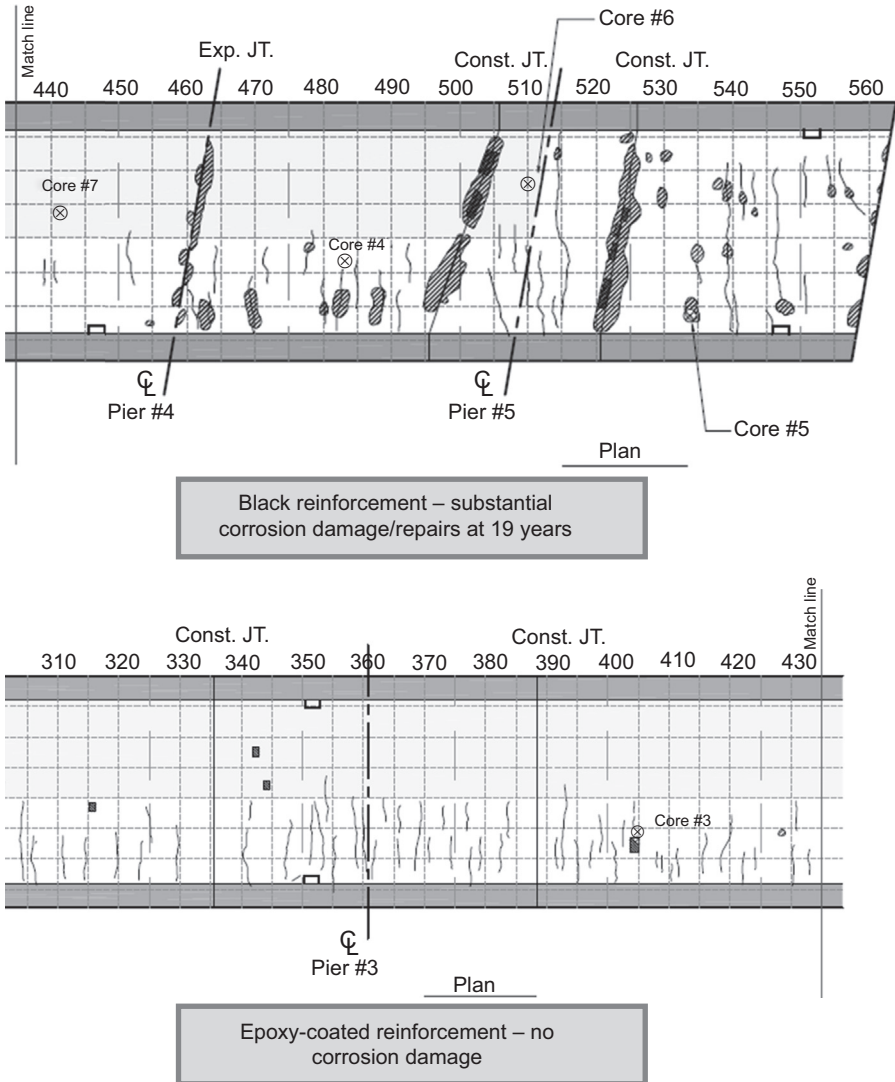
Deterioration maps of West Virginia Bridge 2930 after 34 years of service. This structure contains both uncoated and epoxy-coated bars. Top: Delamination and cracking in the bridge section containing the uncoated bars. Bottom: No delamination or cracking in the bridge section containing epoxy-coated reinforcing steel.
